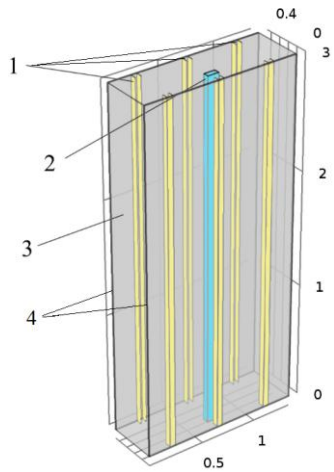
Geometrical parameters of the structure: 1 – U-shaped stud; 2 – steel tube with rectangular cross-section; 3 – polystyrene concrete; 4 – magnesium oxide formwork.
